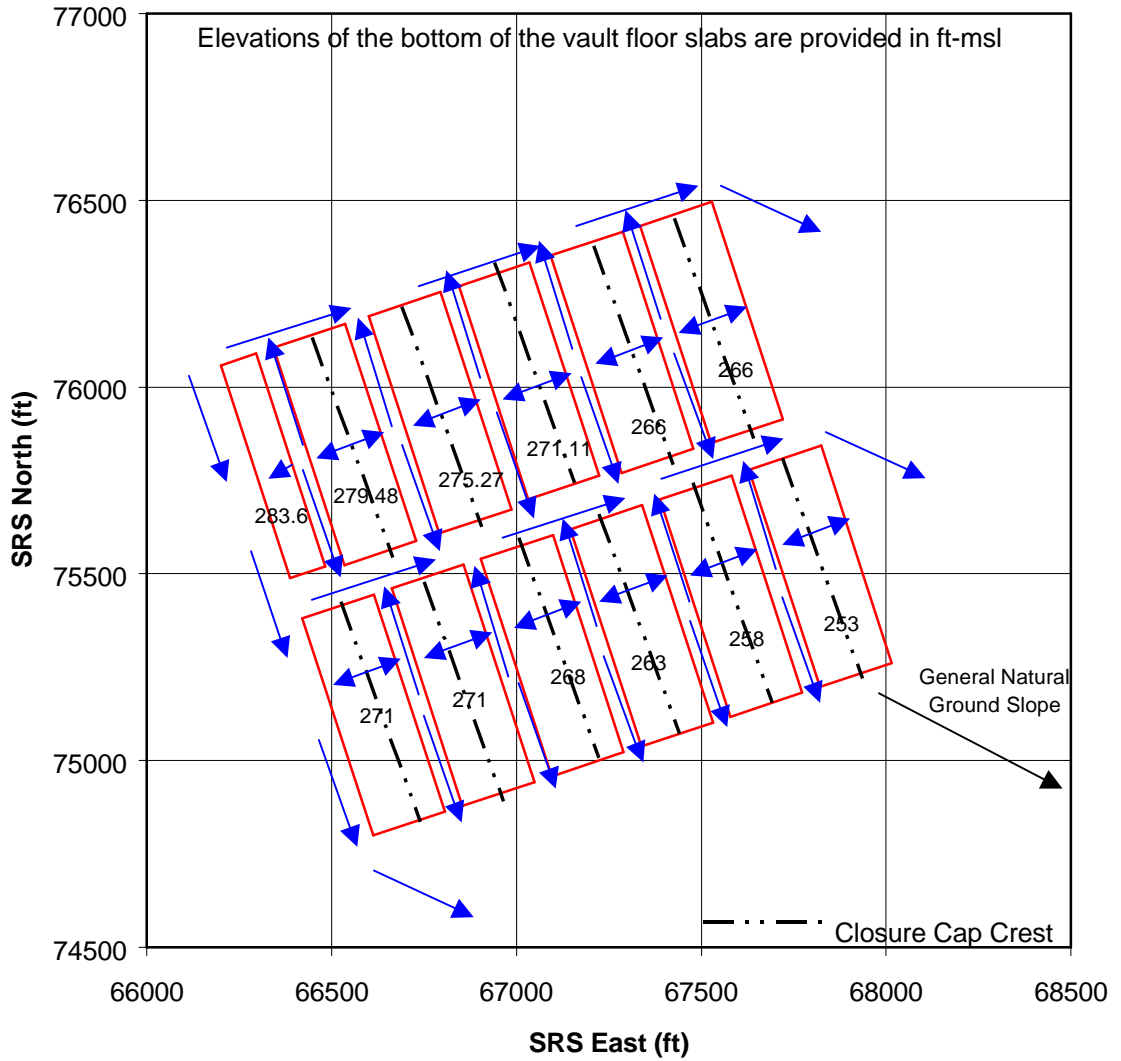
100-Foot Slope Length Drainage System Configuration
